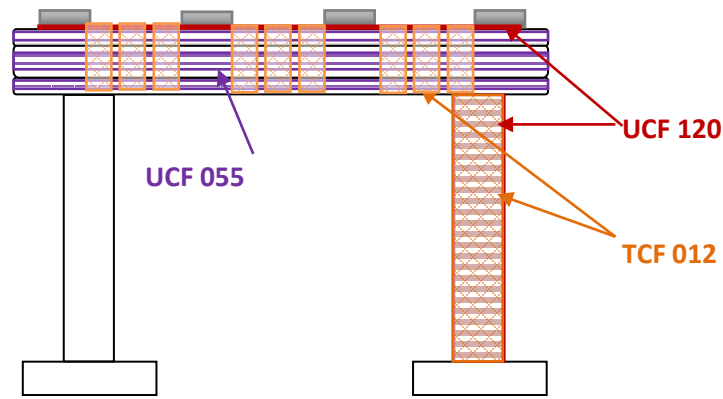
General retrofit scheme for impact damaged pier cap and column
